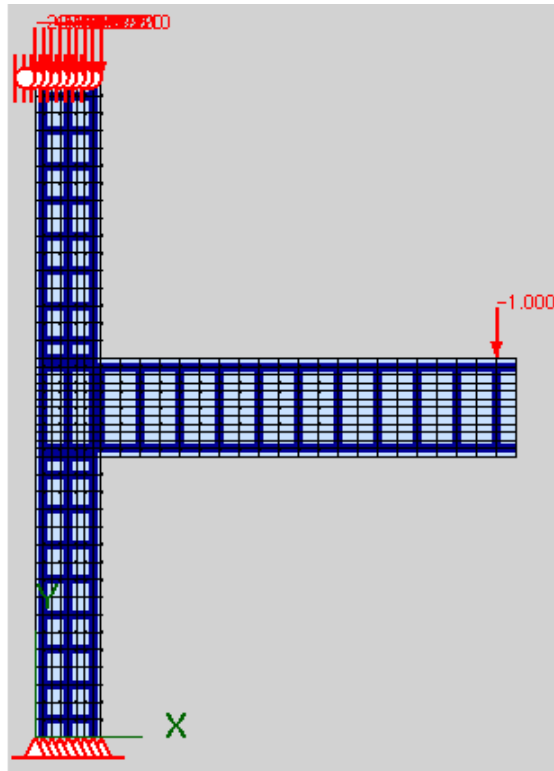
Exterior Beam-Column Joint Model in VecTor2
